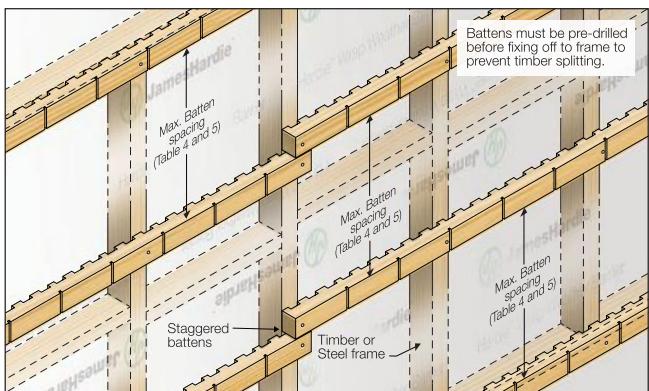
ON-STUD STAGGERED JOINTING OF BATTENS
